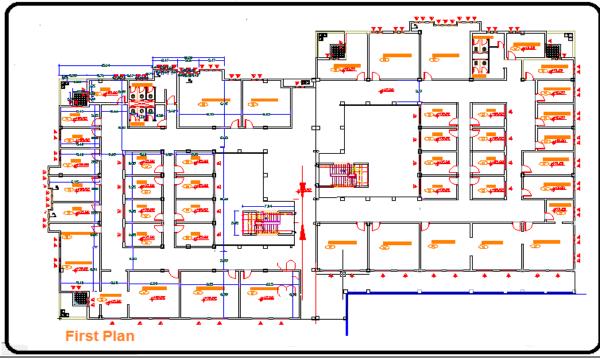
First floor plan for one department in the building 5.0 Proposed Alternatives to the Air-conditioning System
